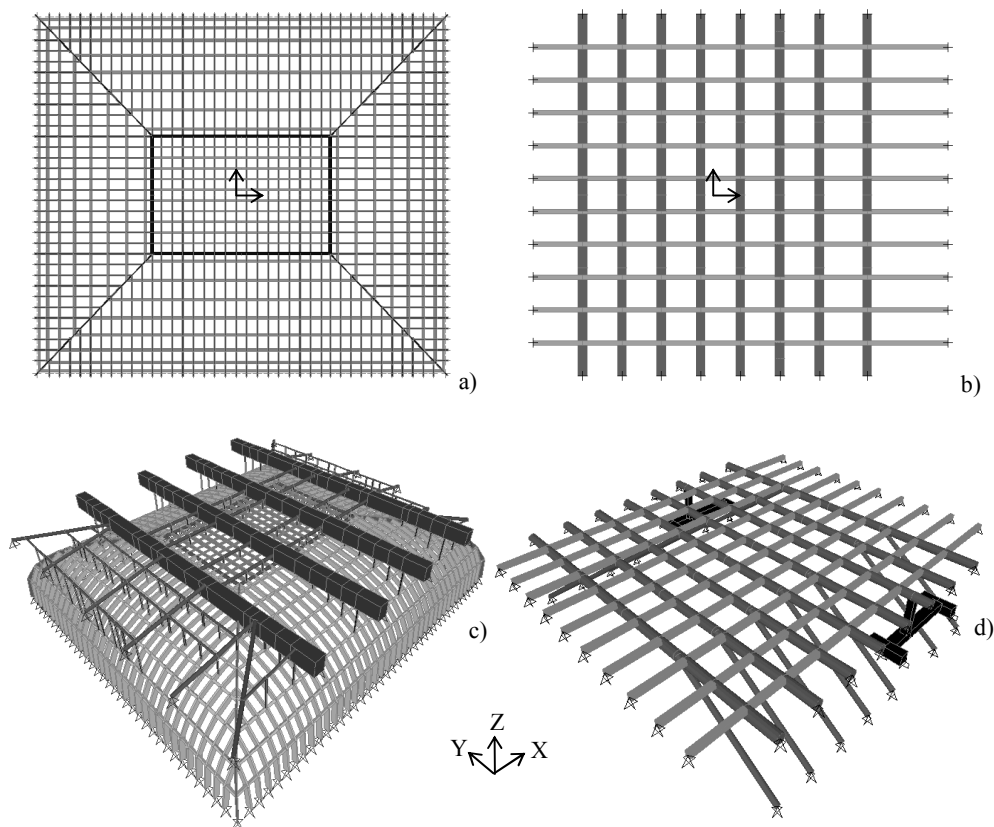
Third Anteroom (V) – Structural modelling: a) Vault plan; b) Floor beam plan; c) 3D model of the vault linked to the supporting structure; d) 3D model of the floor beam.
